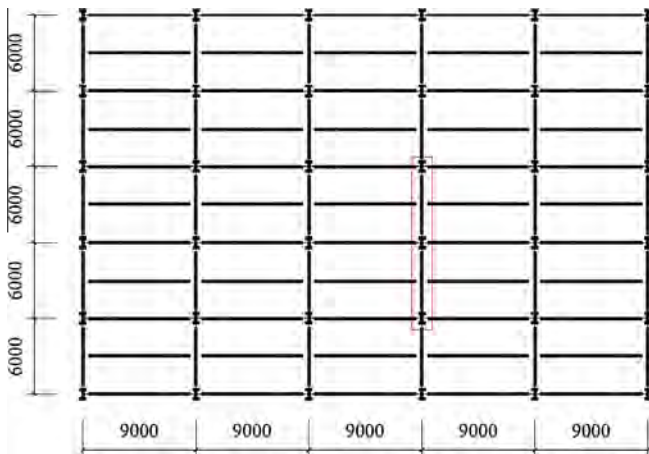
Plan layout of the designed multi-story office building (unit: mm).
